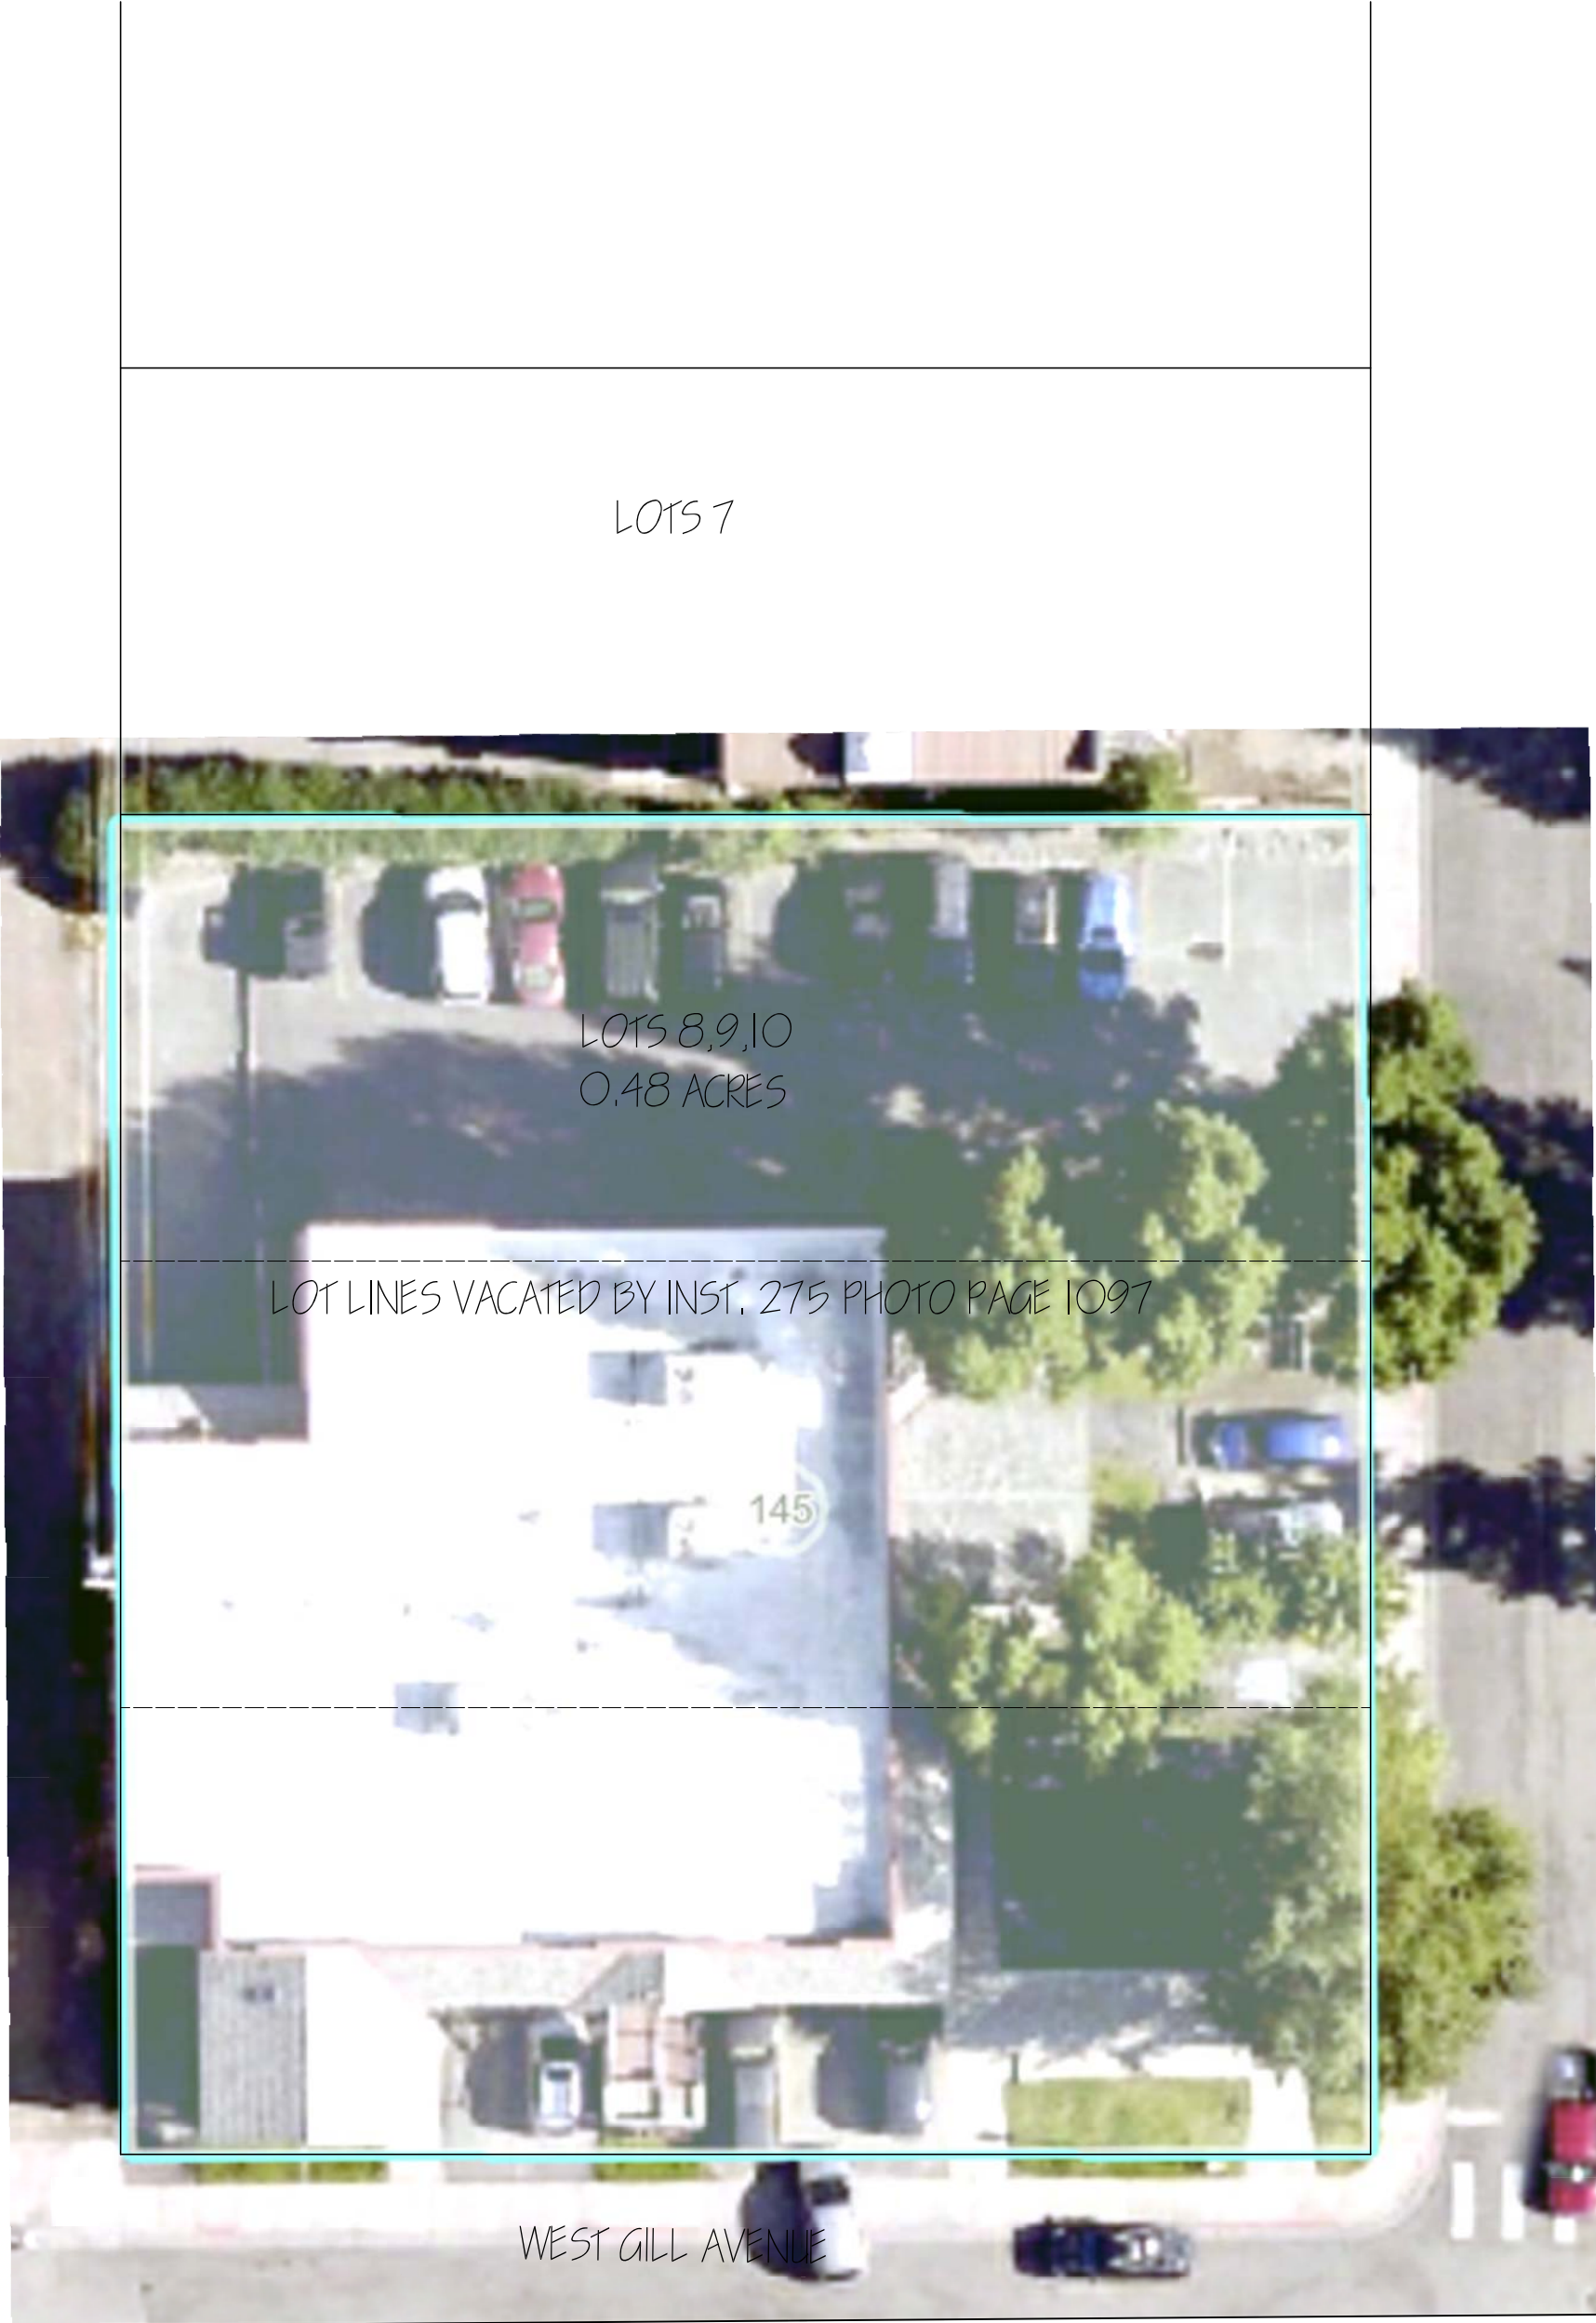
, A1.1, & A1.2 (existing site and floor plans)
